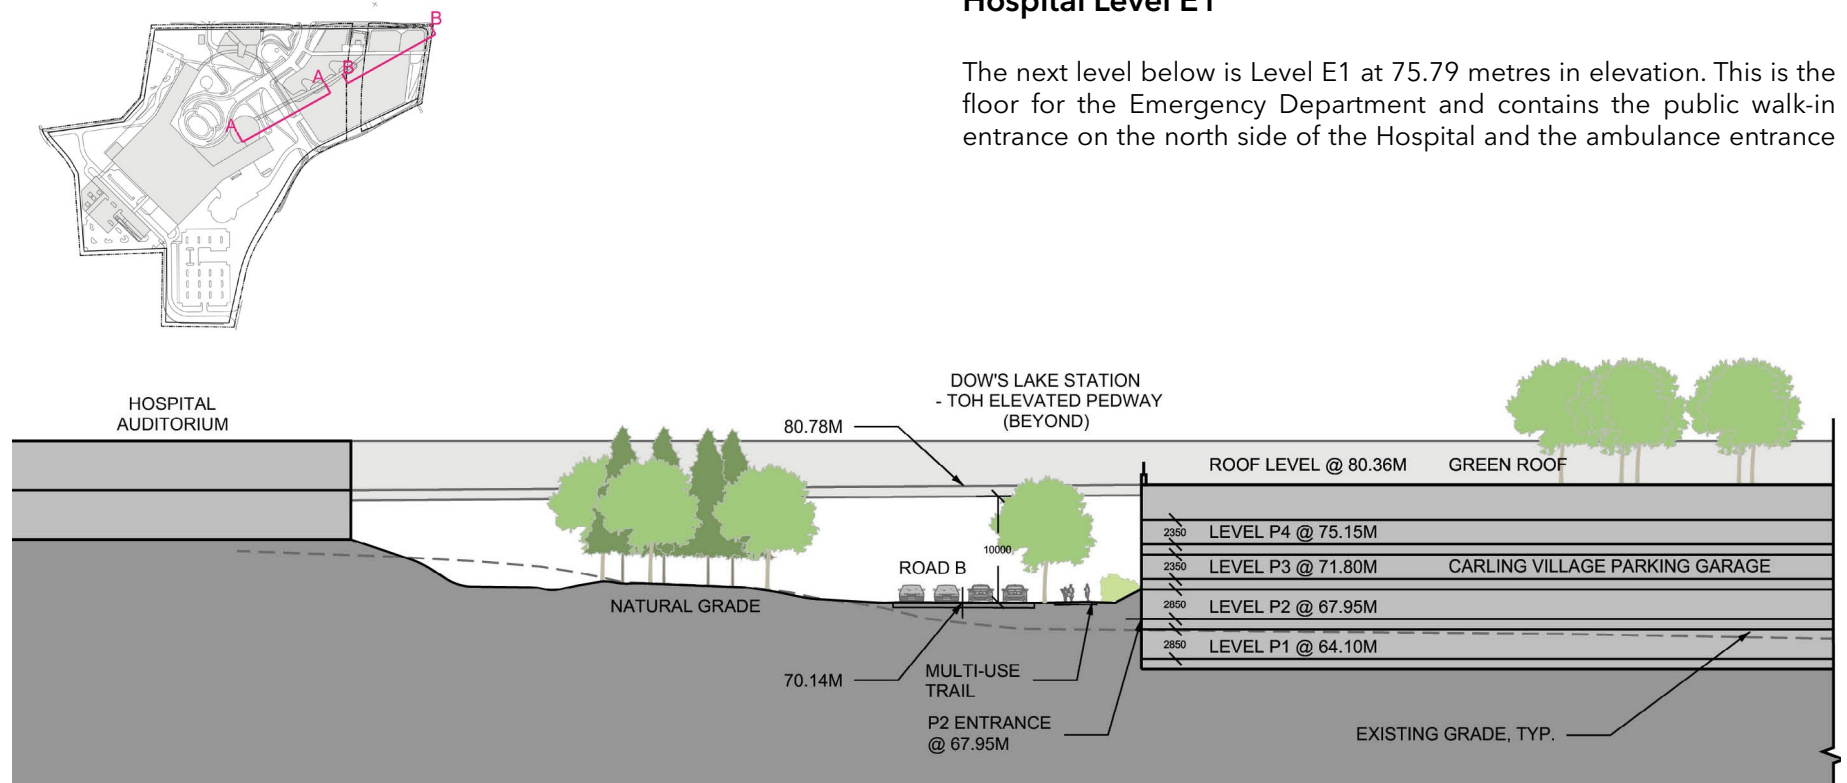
Master Site Plan - Section A Looking Northwest at Road B
